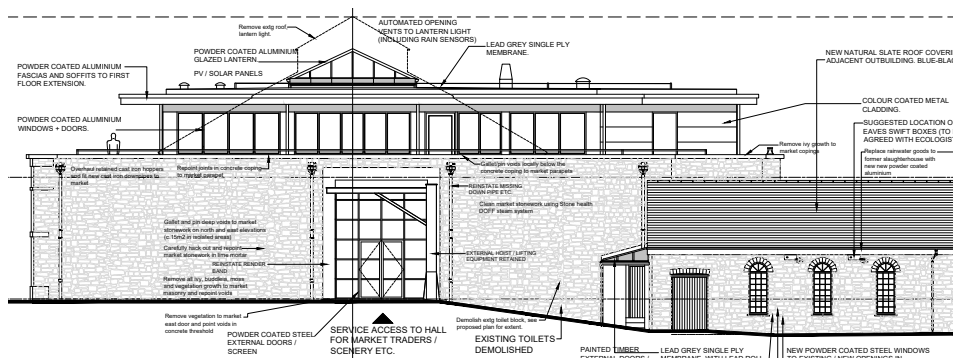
above: Proposed south east elevation – source Pembroke Design Ltd illustrating new glazed door, sunpipes, photovoltaic panels, vents and variation to roof top extension openings, slate roof finish to slaughter house
